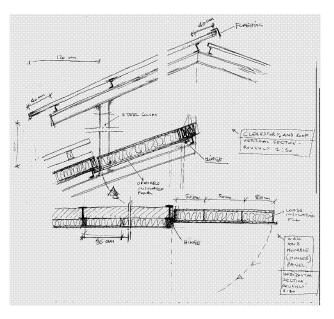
Detailed sketches of transversal (top) and horizontal (bottom) sections.
